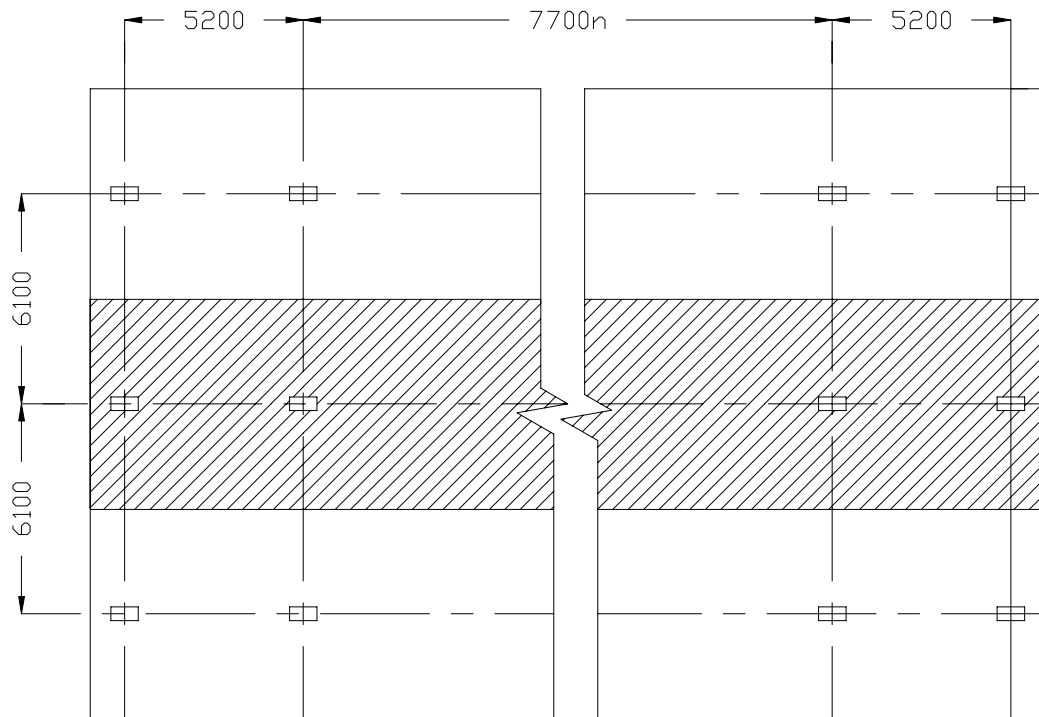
Example Slab with 'n' Interior Spans, Plan View
